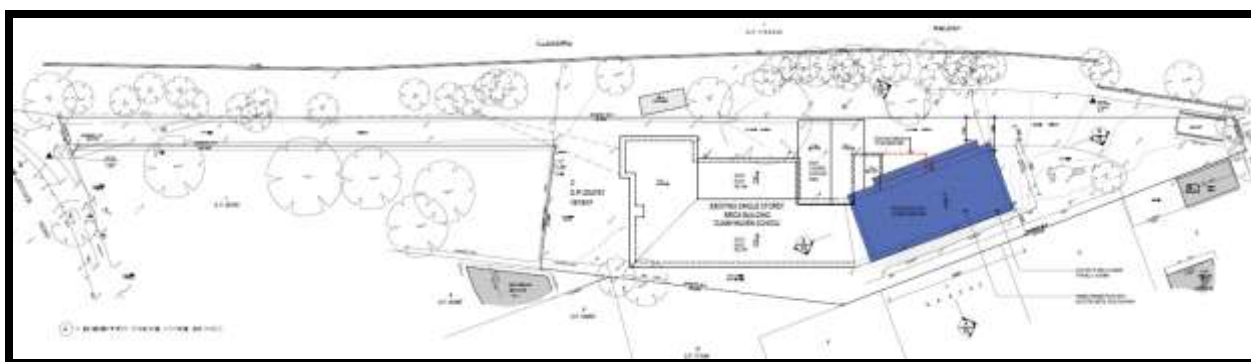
Site plan of subject site (Source: Innovate Architects 2019).
